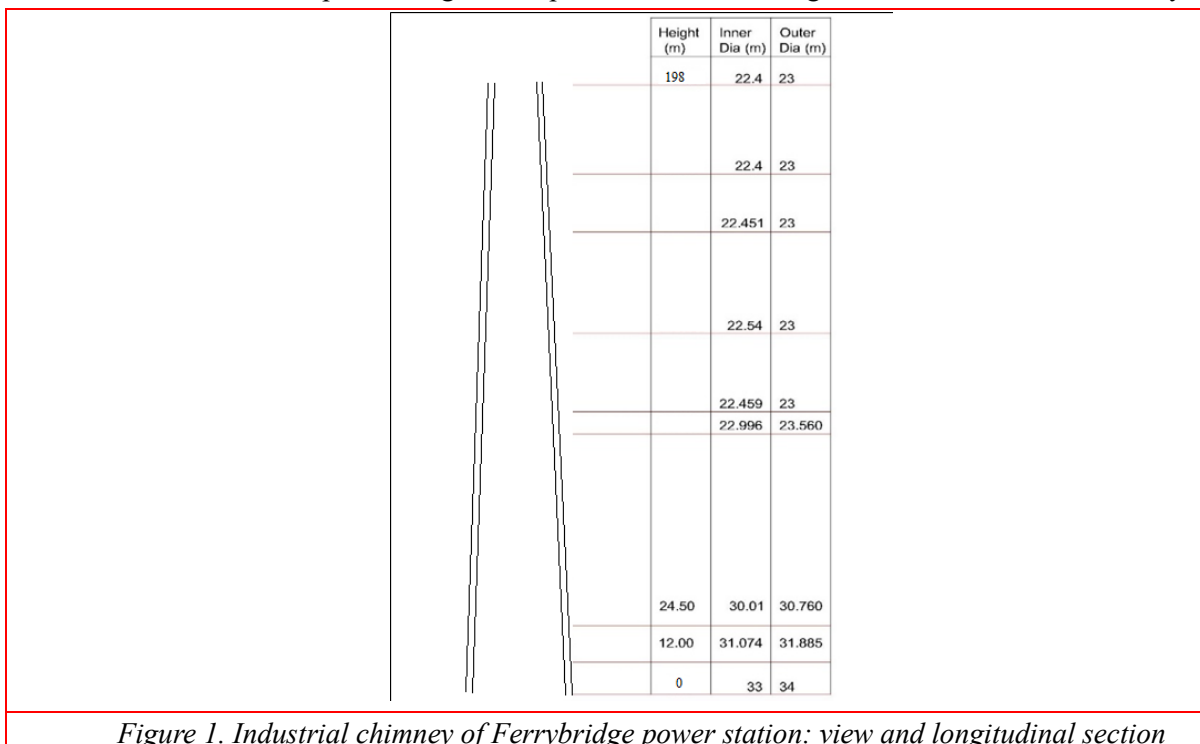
Industrial chimney of Ferrybridge power station: view and longitudinal section
